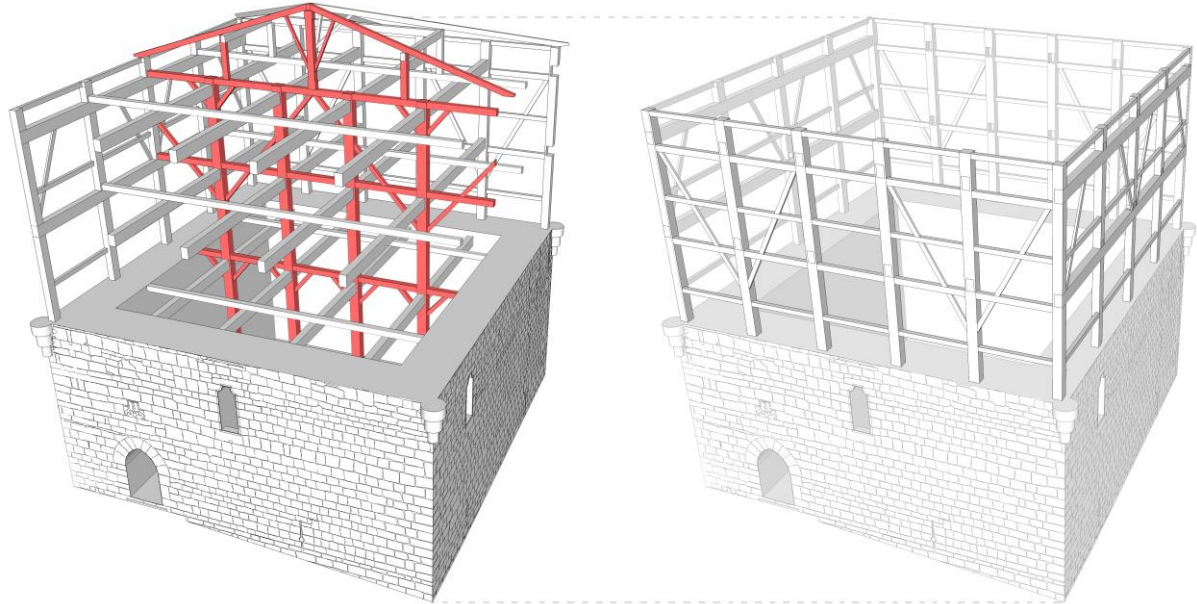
Hypothetical reconstruction of the structure. Interior and exterior framework
